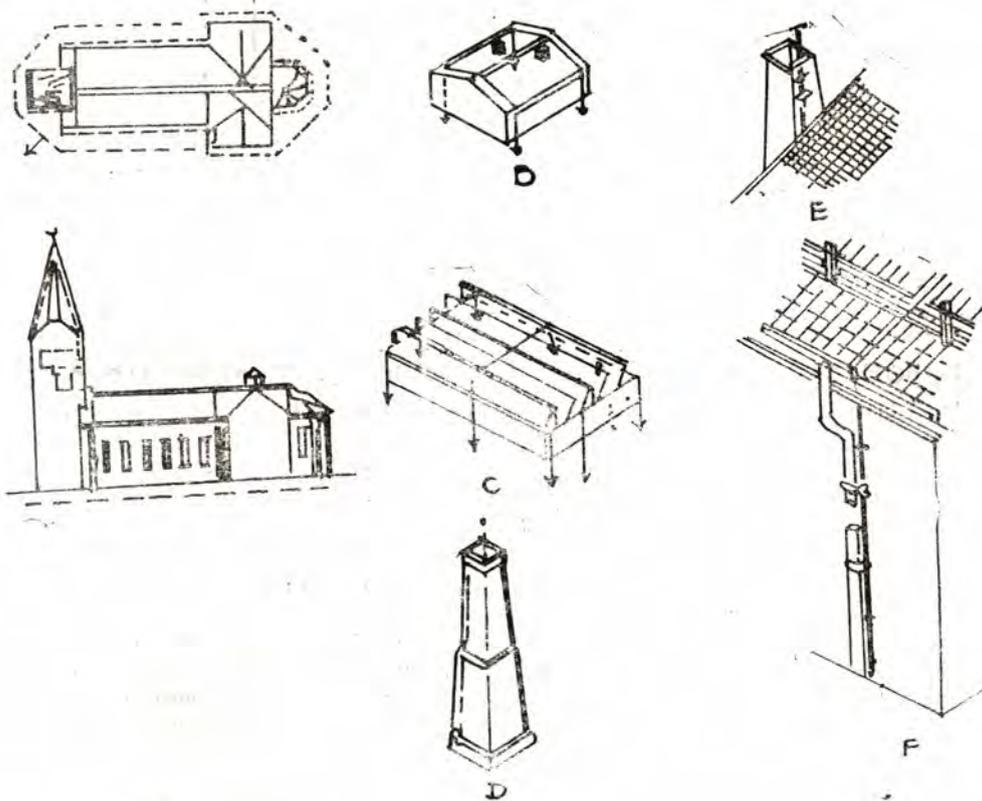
SOME BUILDINGS OR PARTS OF BUILDINGS ILLUSTRATING HOW LIGHTNING PROTECTIVE SYSTEM IS ADOPTED
